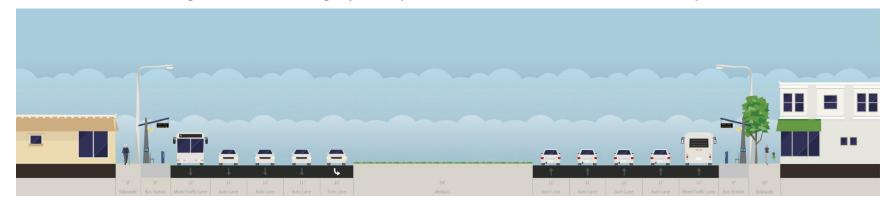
LPA Runningway Concept Cross Section - Washtenaw Avenue
